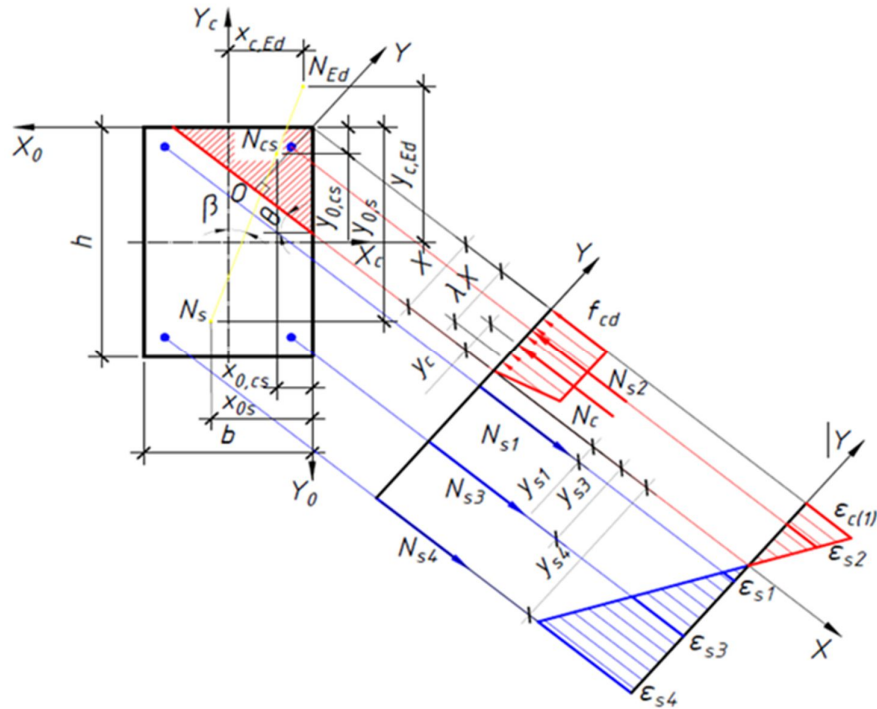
Design scheme of the normal cross-section of a biaxially bended reinforced concrete column with a triangular shape of the compressed area
